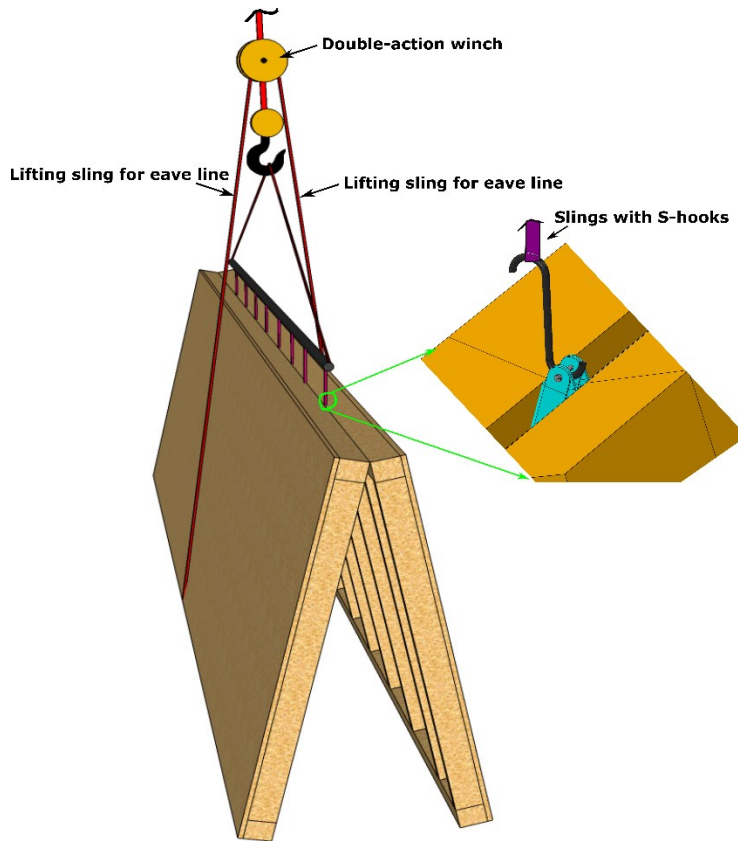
Attach the lifting slings at the eave line to open the roof panel.
